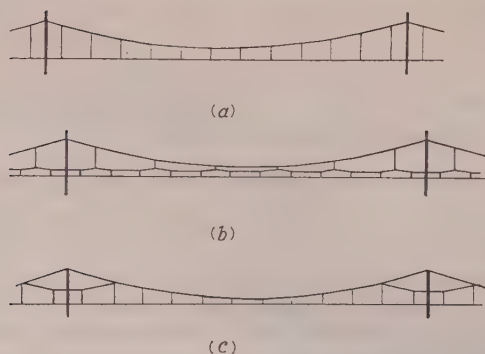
Schematic elevations of three principle systems of overhead equipment.
